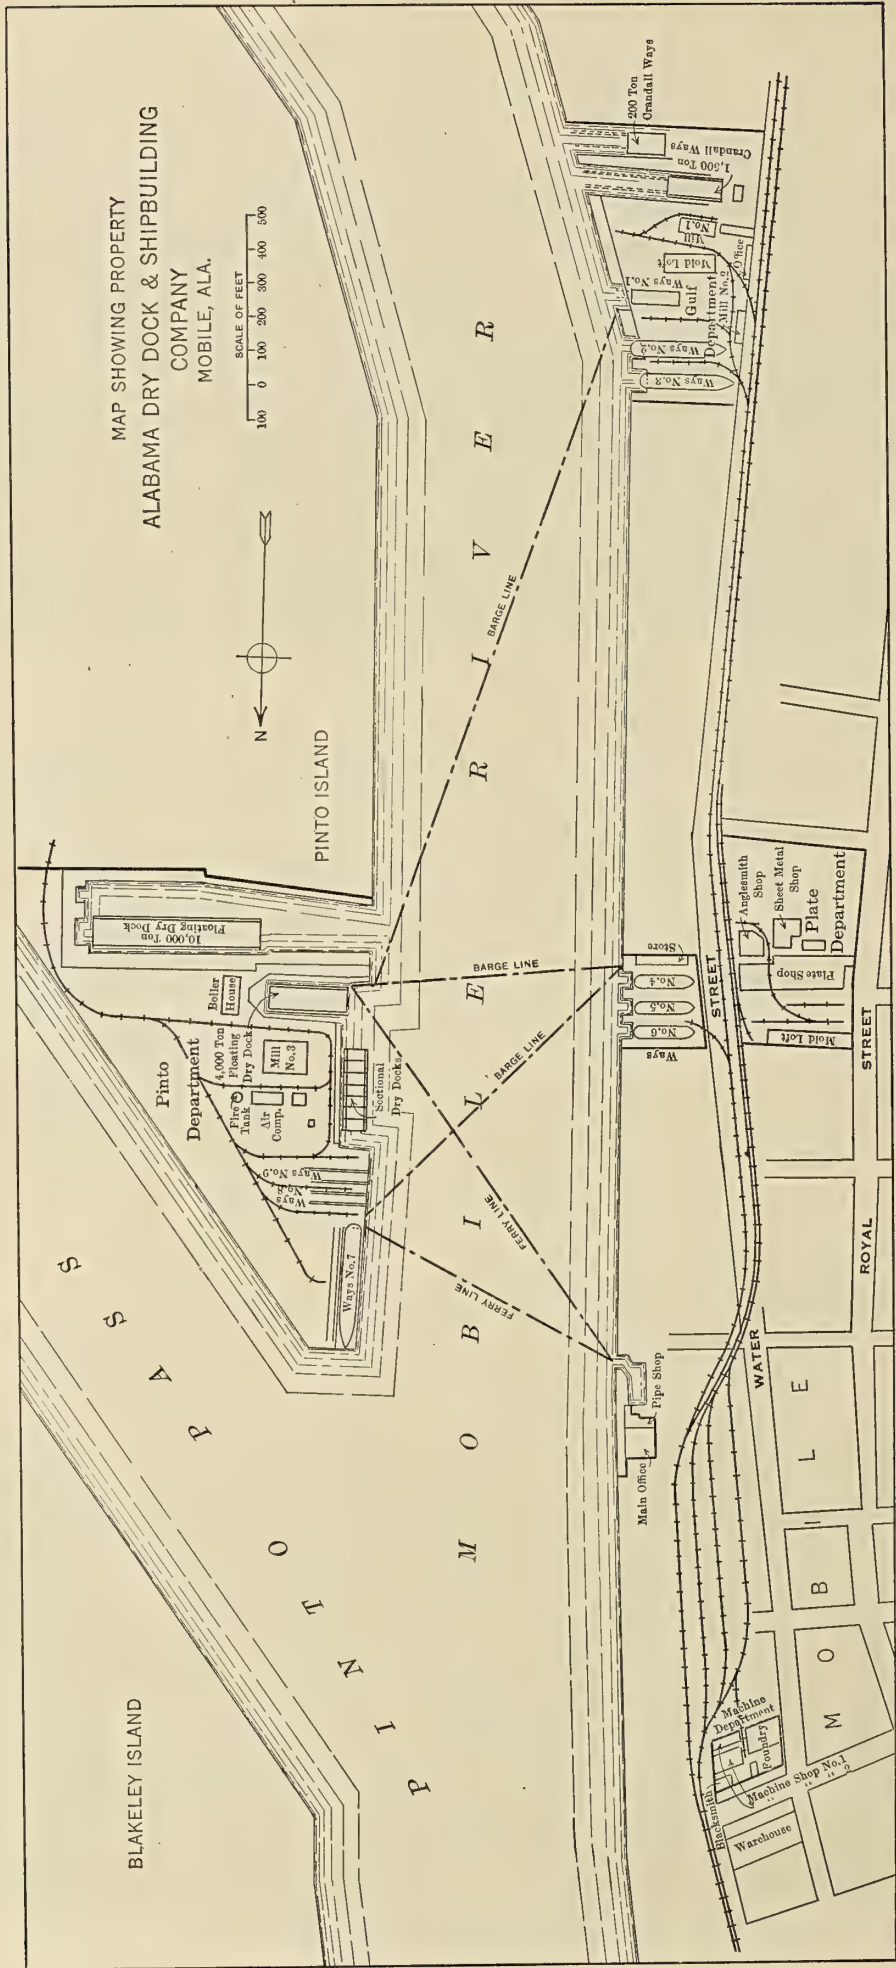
Map Showing Location of Separate Plants and Railroad and Ferry Connections
